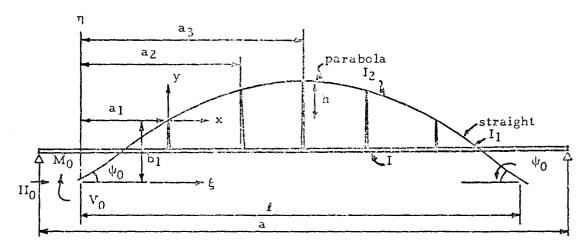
BRACED ARCH BRIDGE, ELEVATION VIEW
